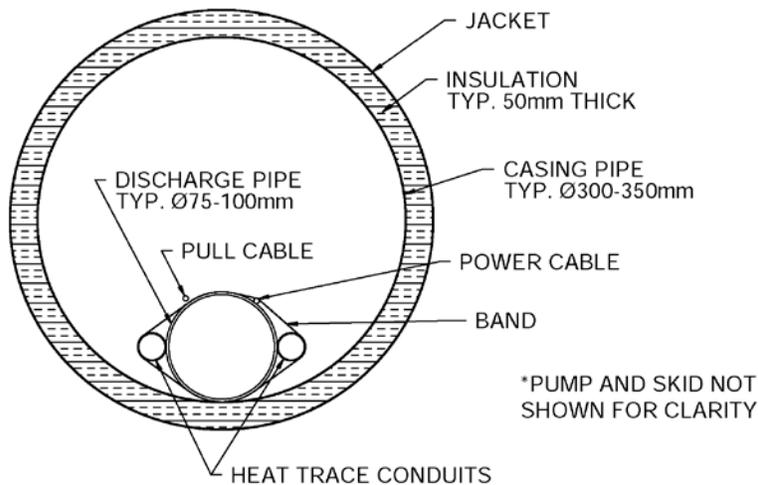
Typical Inclined Shaft Intake Cross-Section
